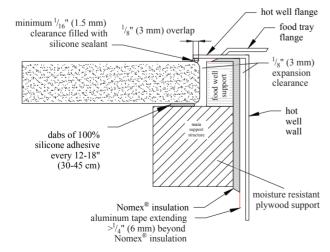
Cutout Assembly Cross Section View with Wood Support – Underlayment
